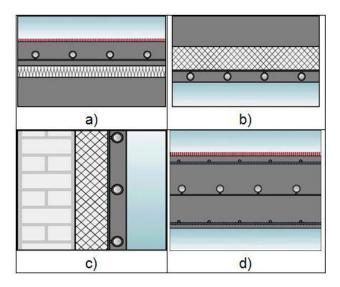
Examples of embedded radiant systems, a) Floor, b) Ceiling, c) Wall, d) TABS [9].
